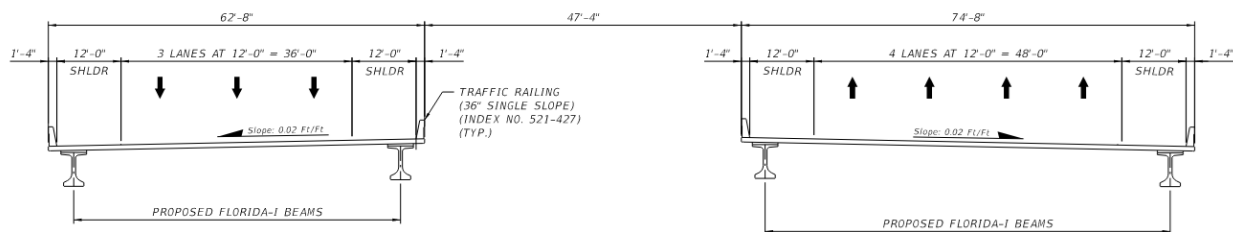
Typical Section for Ramp D2 over Davenport Creek
